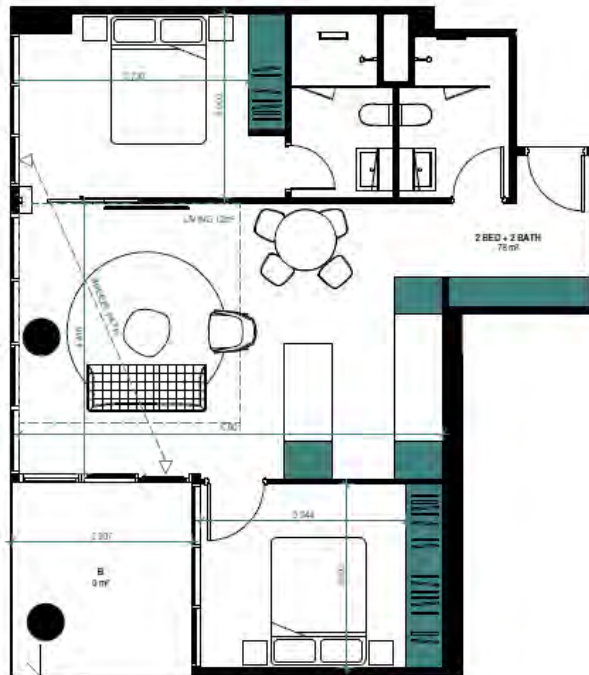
Dwelling Type T04 (source: application plans prepared by Plus Architecture)
